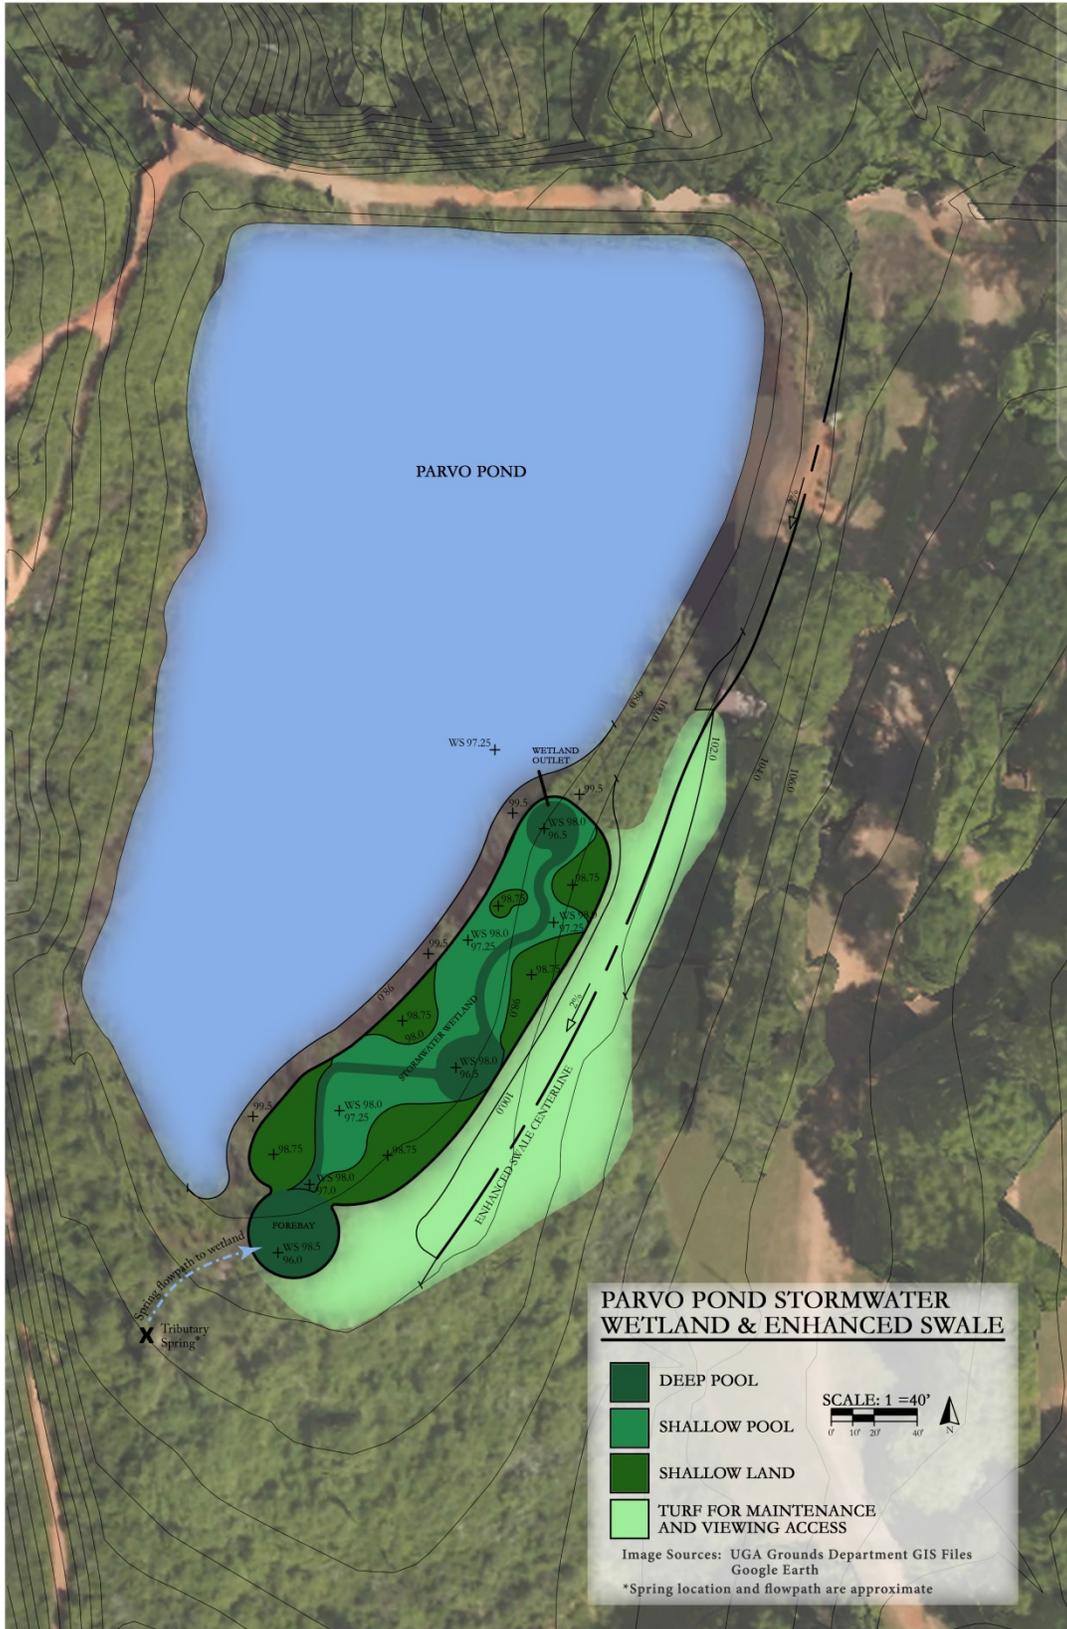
Plan of the proposed stormwater wetland at Parvo Pond
